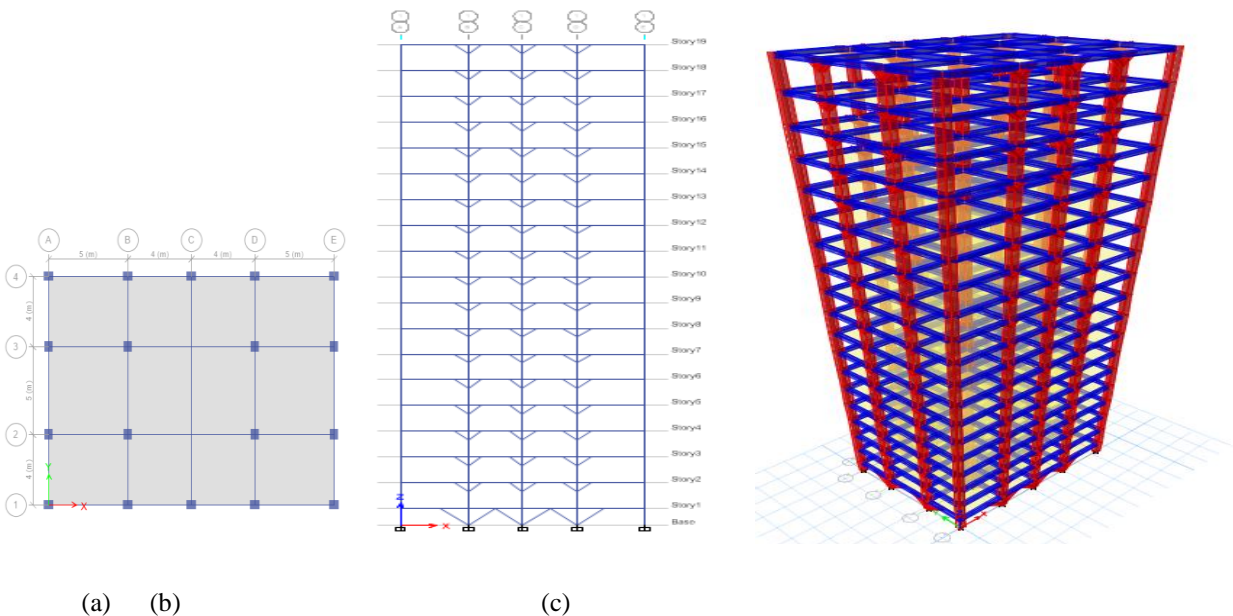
Plan of high rise building with oblique column(a), Elevation of high rise building with oblique column(b), Three Dimensional view of high rise building with oblique column(c)
